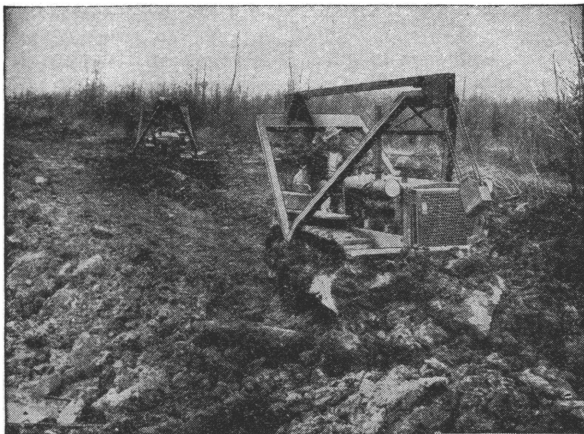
Clearing and grading runway using bulldozers, typical pieces of heavy aviation engineer equipment.
